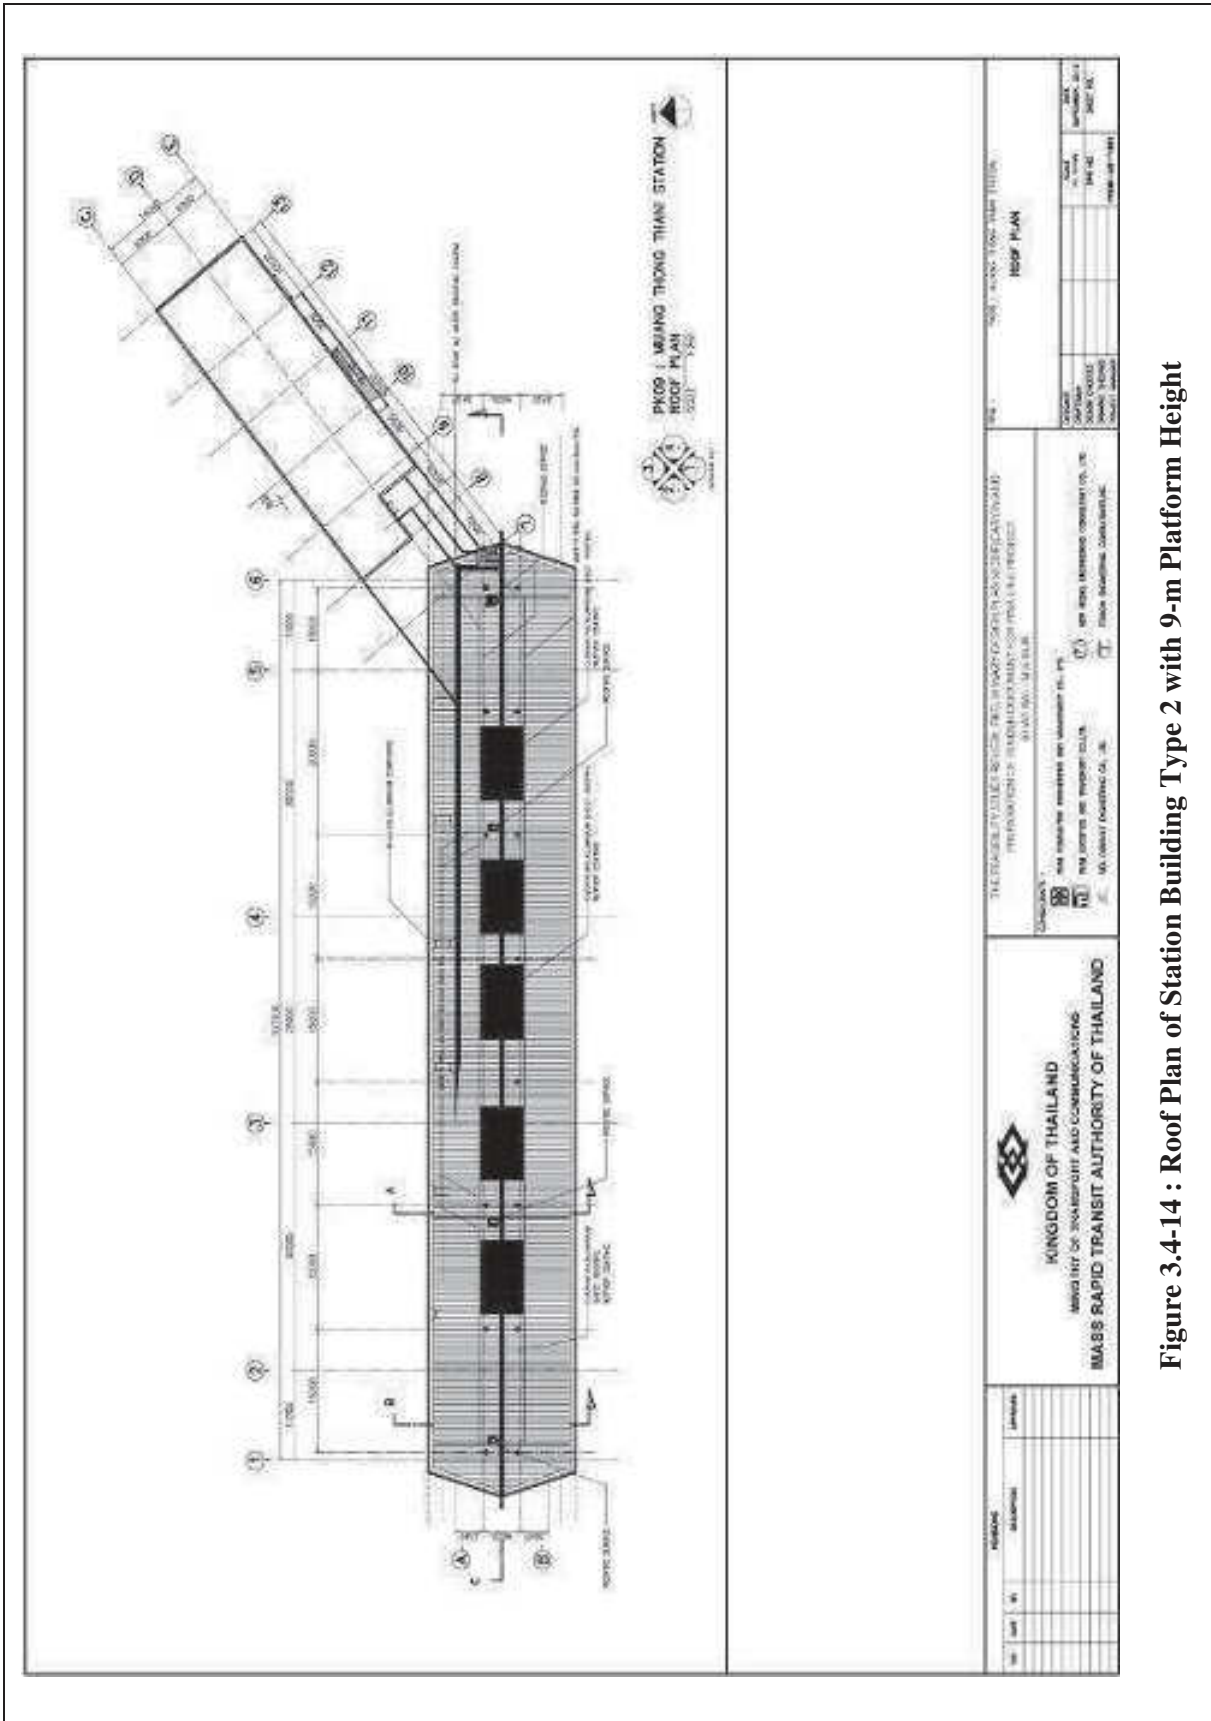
Roof Plan of Station Building Type 2 with 9-m Platform Height
